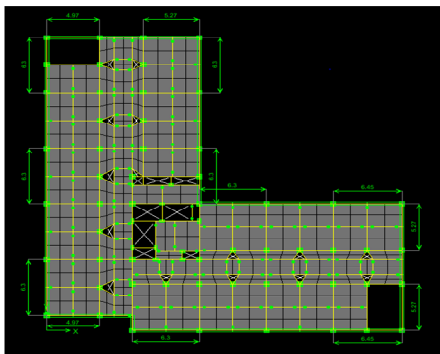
With Bracing System in Outer Location (Provision of Bracings are Indicated by Dimensions Marked Portions)
